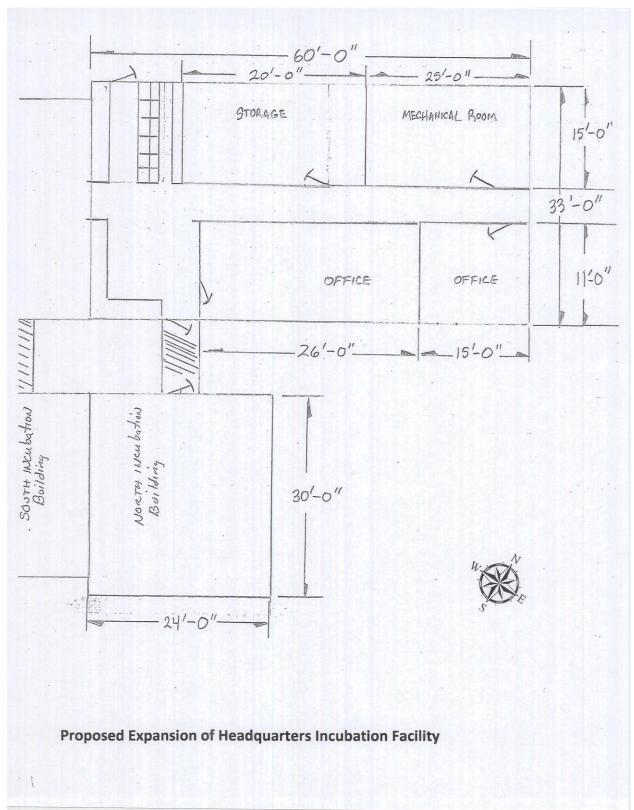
Floor Plan of the Headquarters Incubation Facility Expansion
